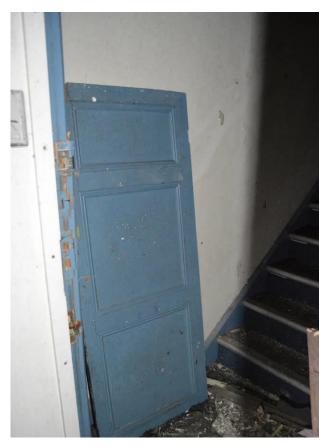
View of cupboard under the stairs door, room G3. Facing south.
